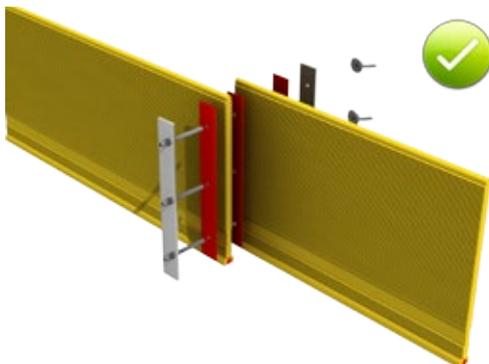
Butt joint in a Sika® KAB 150 with clamping bars and swellable profile insert
